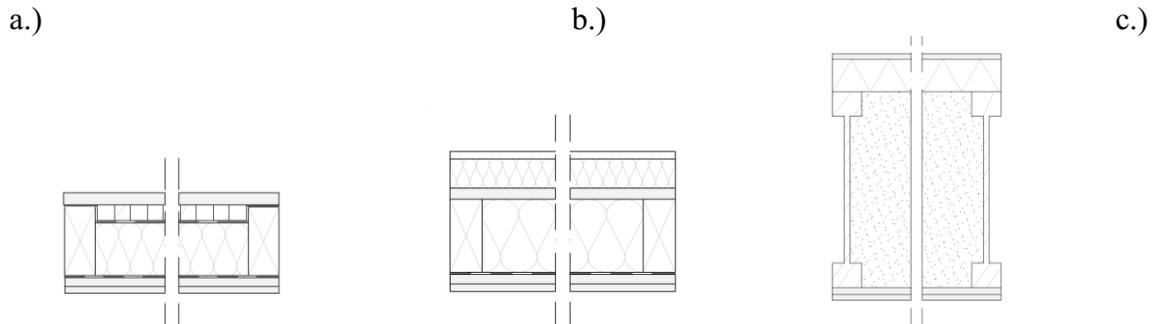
Panel construction, Wood frame construction, Solid wood construction
